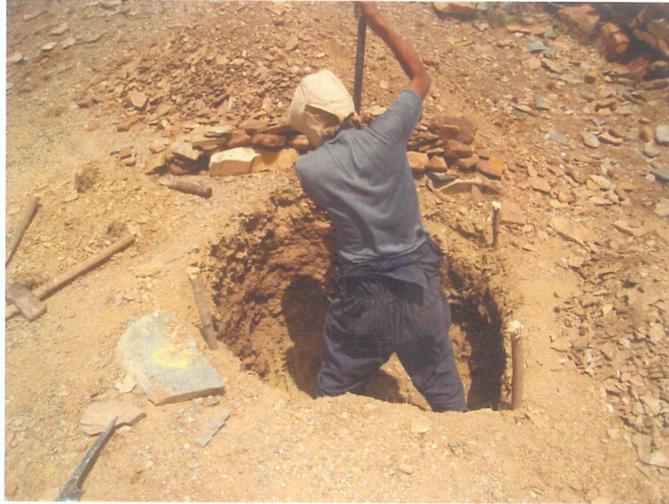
Pit digging and cable anchoring for the establishment of the large fog collectors
